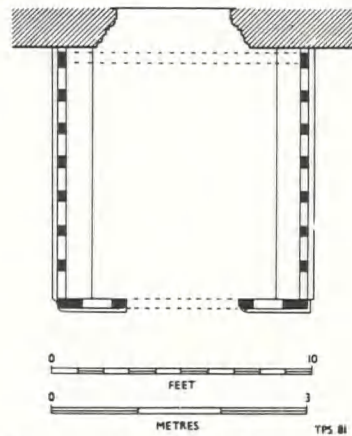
Flitwick, church of St Peter and St Paul: South Porch: Plan
